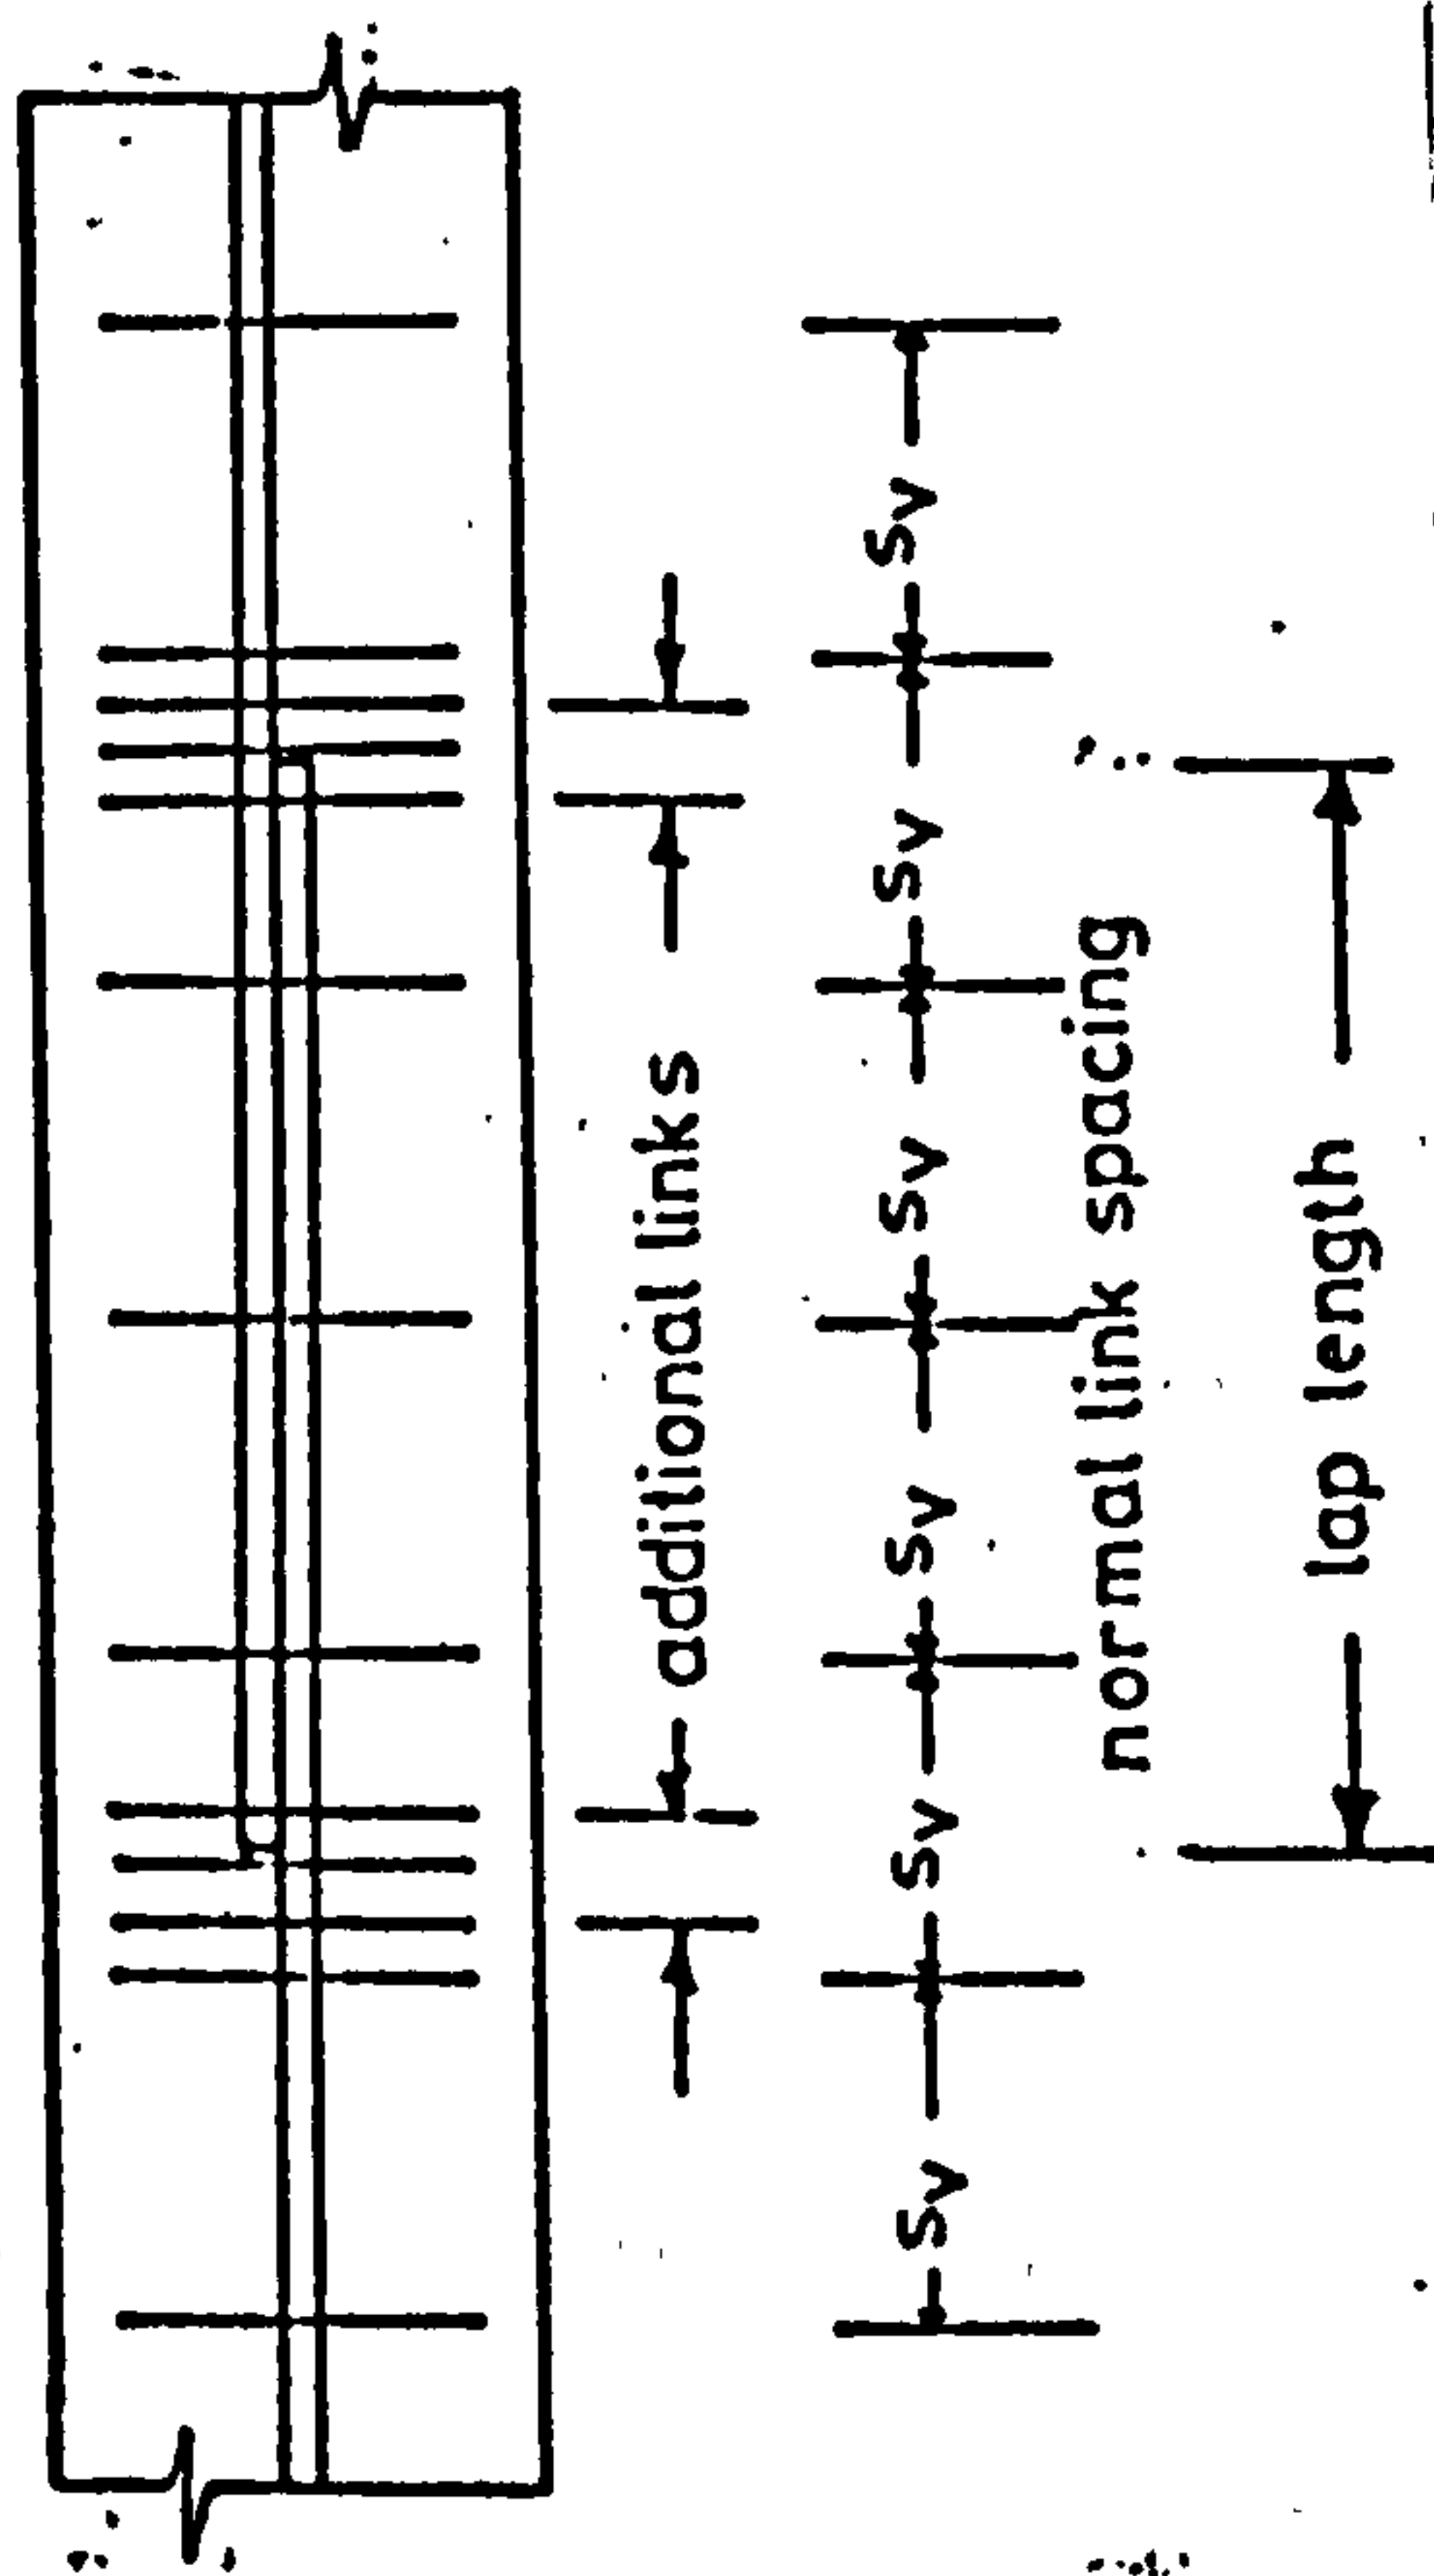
Recommended detailing of secondary reinforcement around compression lapped joints of large diameter reinforcing bars, from Leonhardt and Teichen<sup>(2)</sup>.
